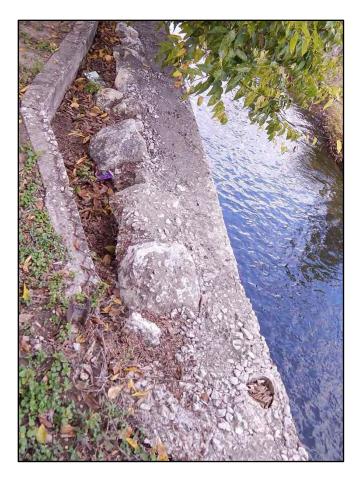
Concrete wall with remnant of chain-link fence built behind the original stone retaining wall.
